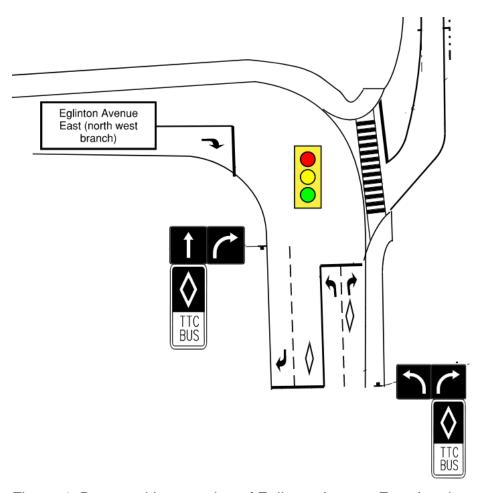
Proposed Intersection of Eglinton Avenue East (north-west branch) and Scarborough Busway
